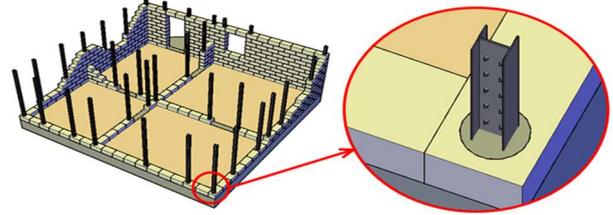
Hybrid structure for low-rise buildings / Structură hibridă pentru clădiri joase.
